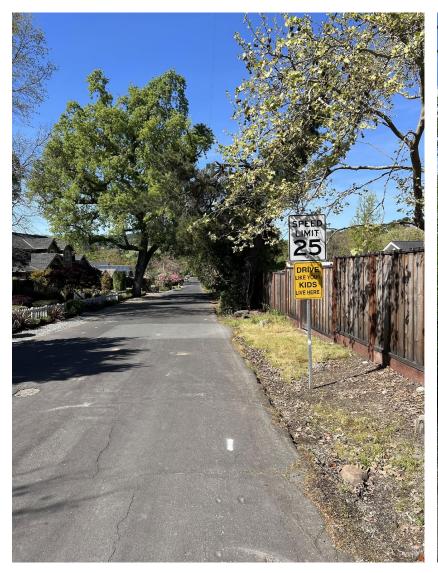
MORAGA RD. APPROACH ALTERNATIVE 4
